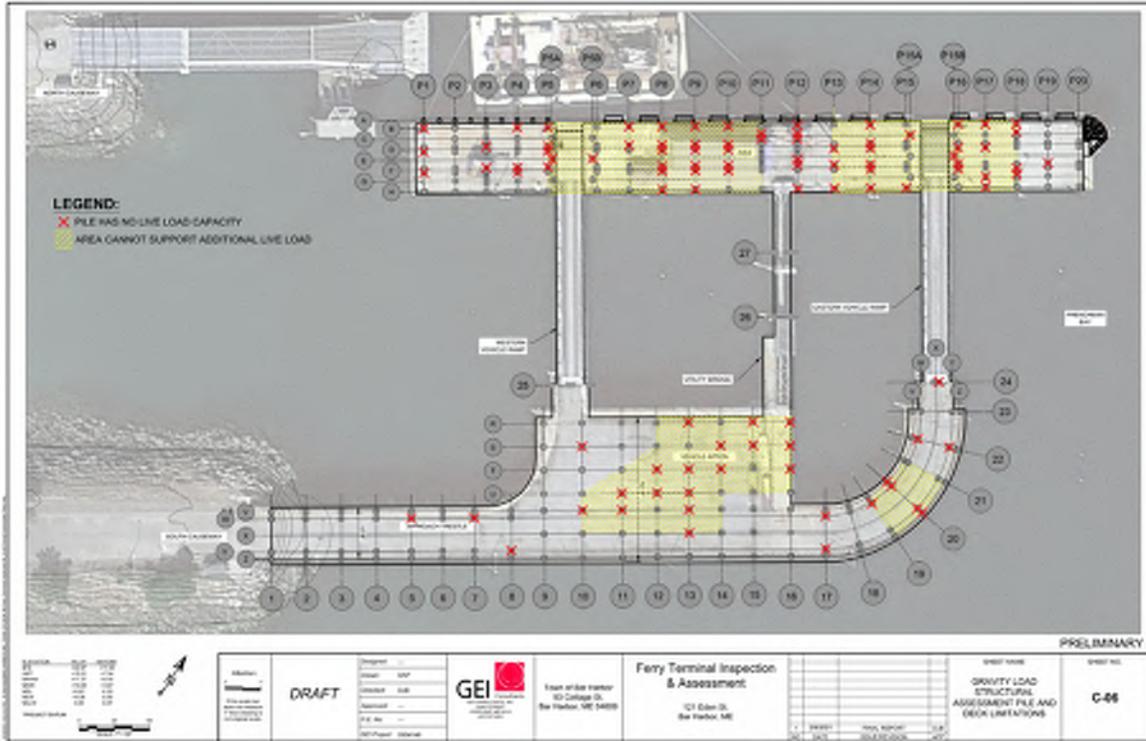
Locations of LC-Piles and No Remaining Live Load Capacity on Pier Deck
